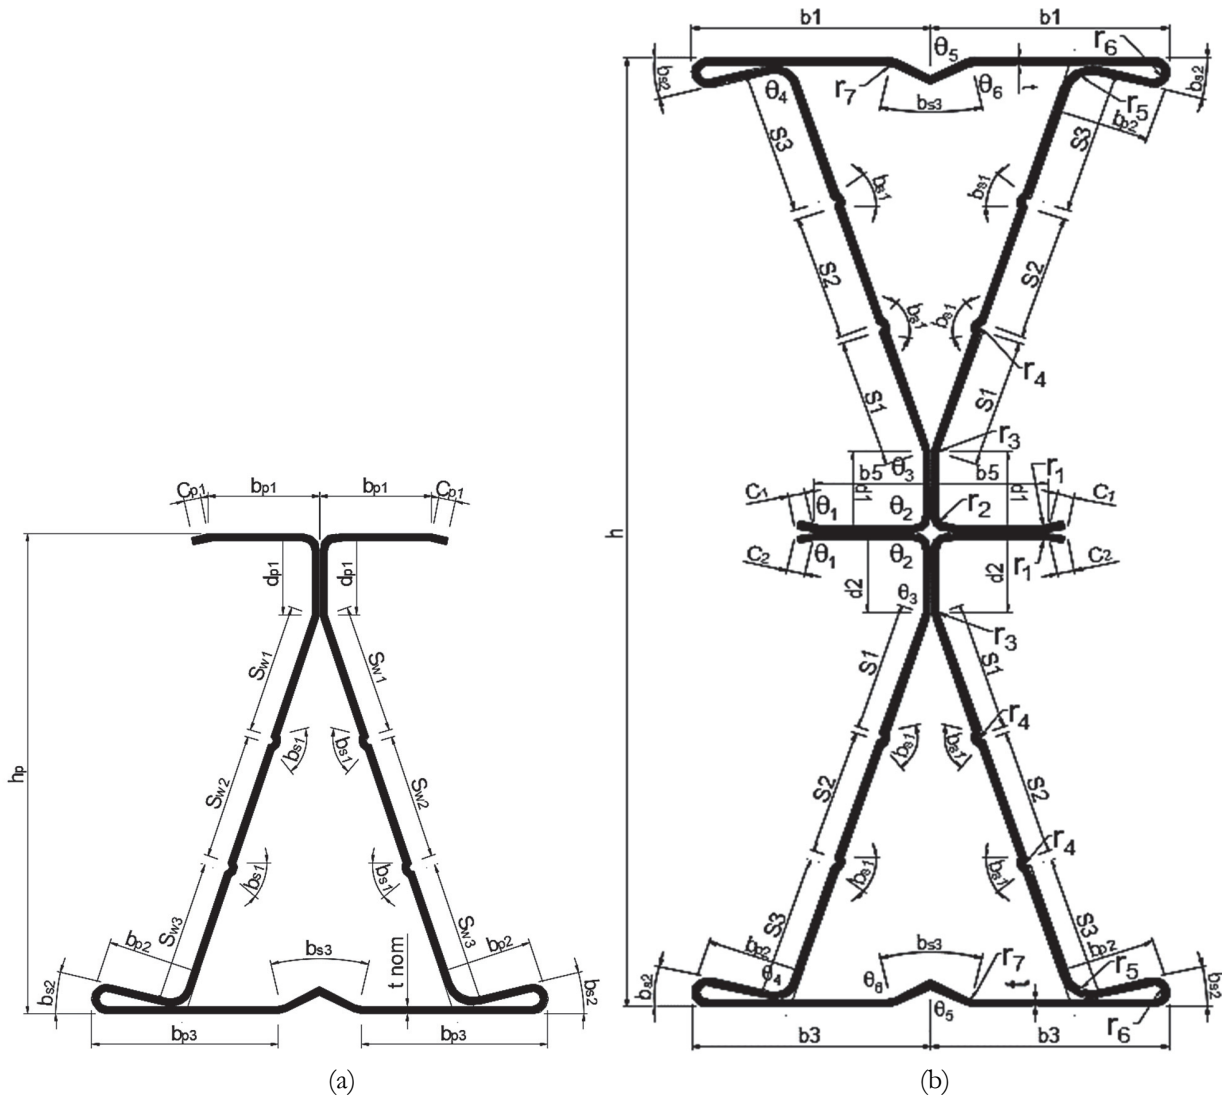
Beam Cross-Sections, (a) delta section and (b) bi-delta section.
